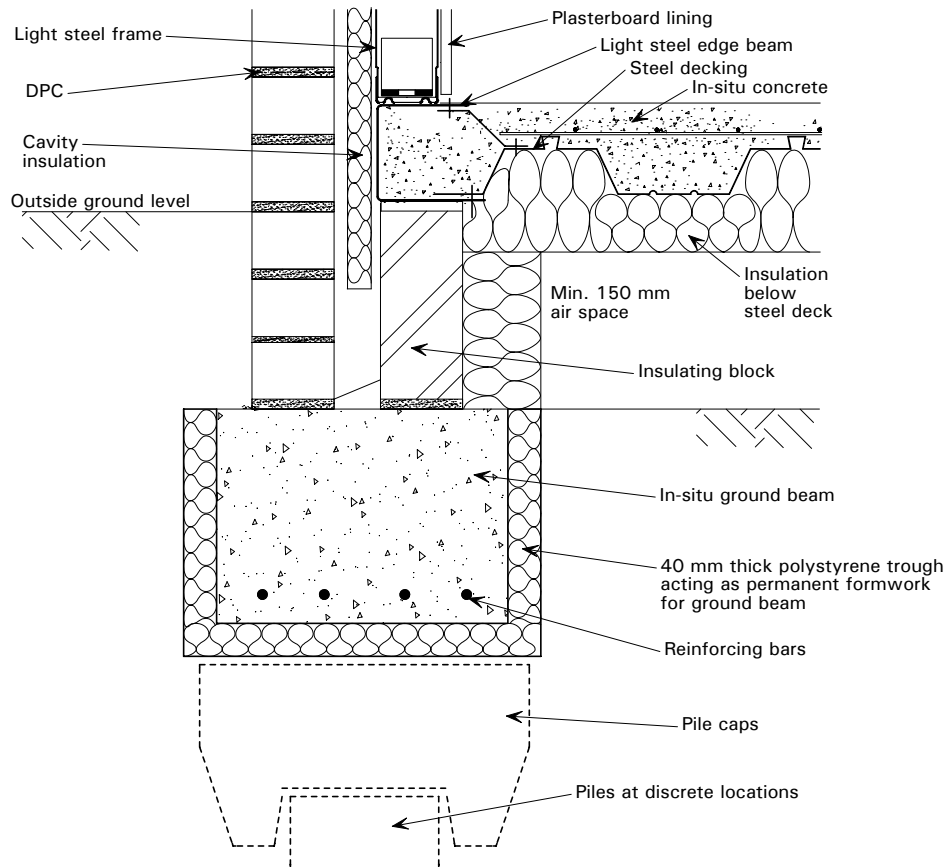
Piled composite ground-floor system with in-situ ground beams formed within polystyrene trough
